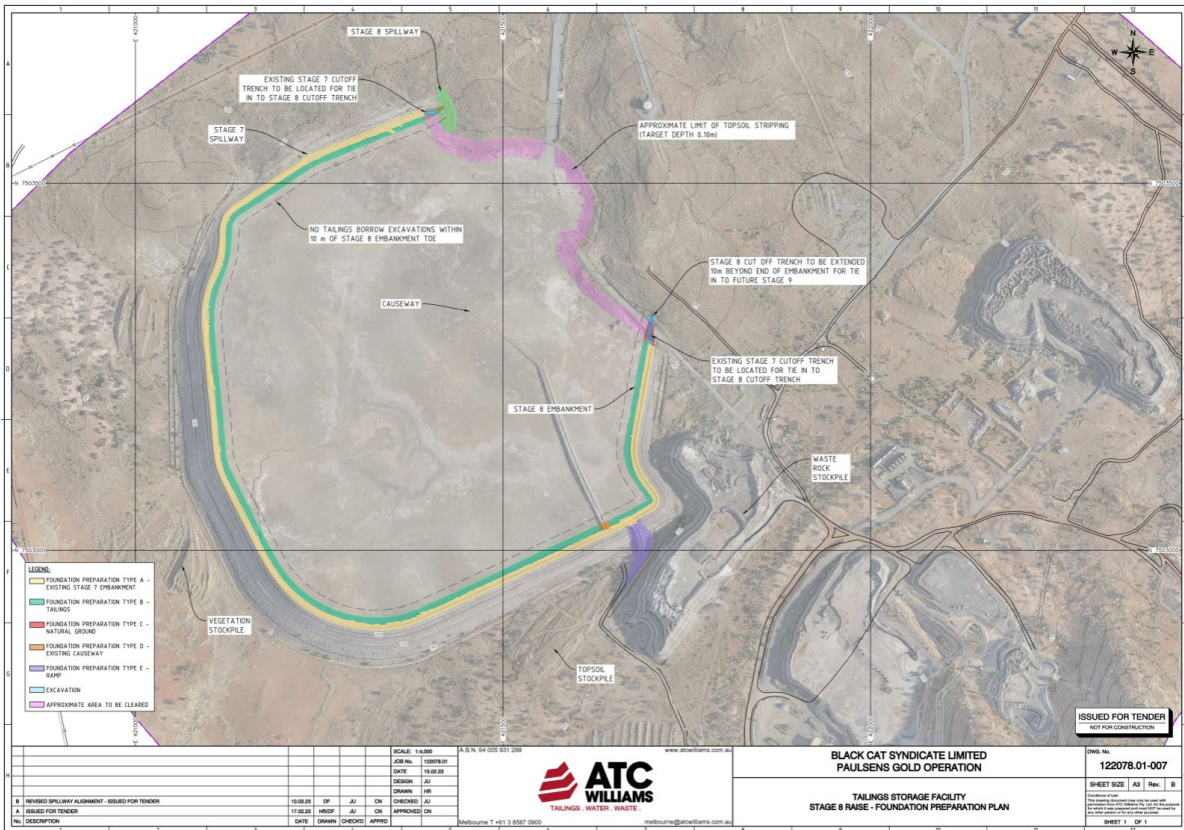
Paulsen above-ground TSF Lift 8 general arrangement
